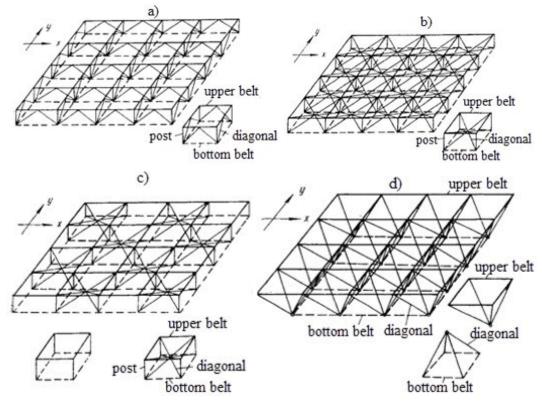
Space grid structures with square mesh belt: a – type of vertical cross trusses in two directions; b, c – with the location of braces outside the plane of the trusses; d – type of inclined cross trusses in two directions
